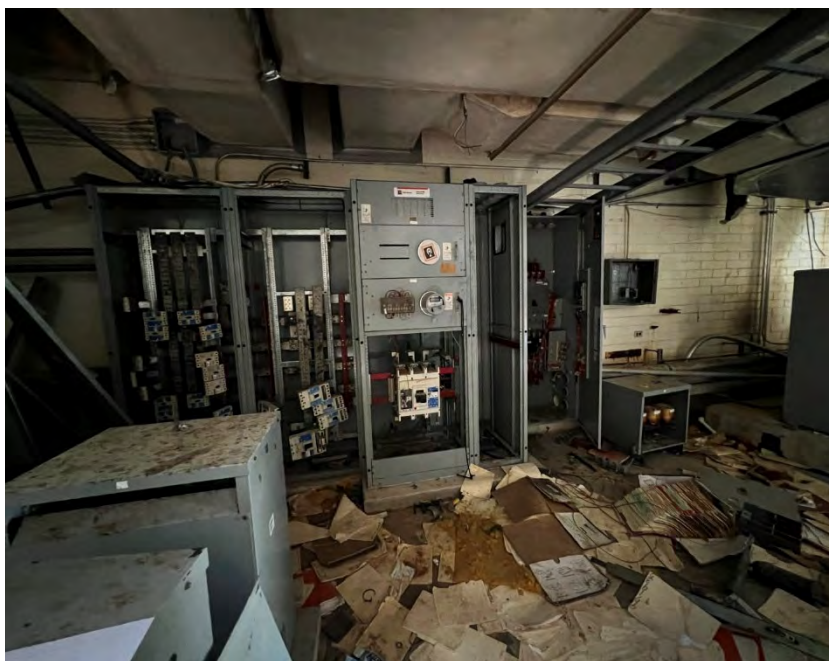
MAIN SWITCHBOARD IN ELECTRICAL/MECHANICAL ROOM
